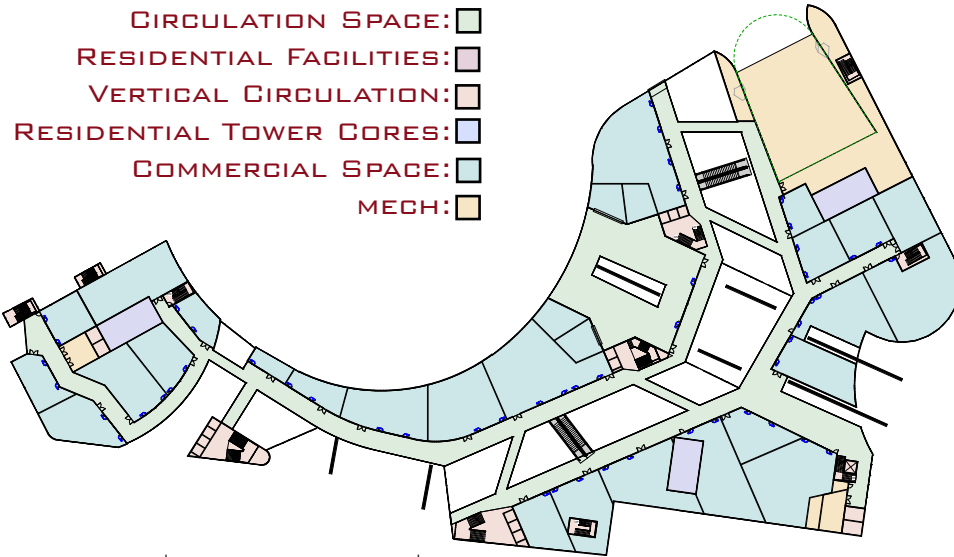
| LEVEL 3 FLOOR PLAN | DJV
